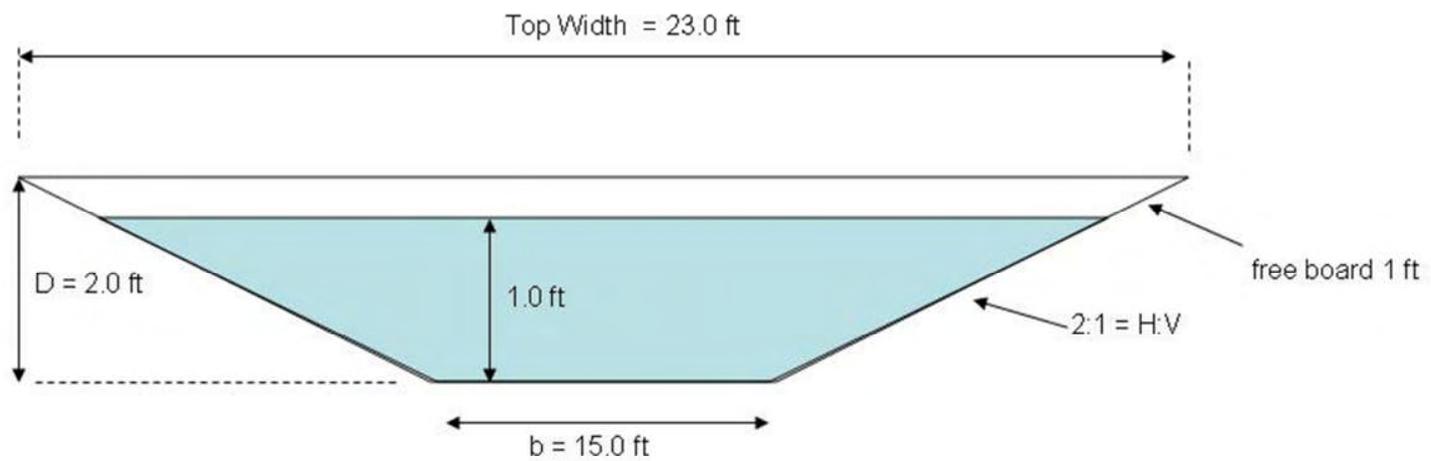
Rock Creek Lower Channel (Section B) Cross Section (Not to Scale)
